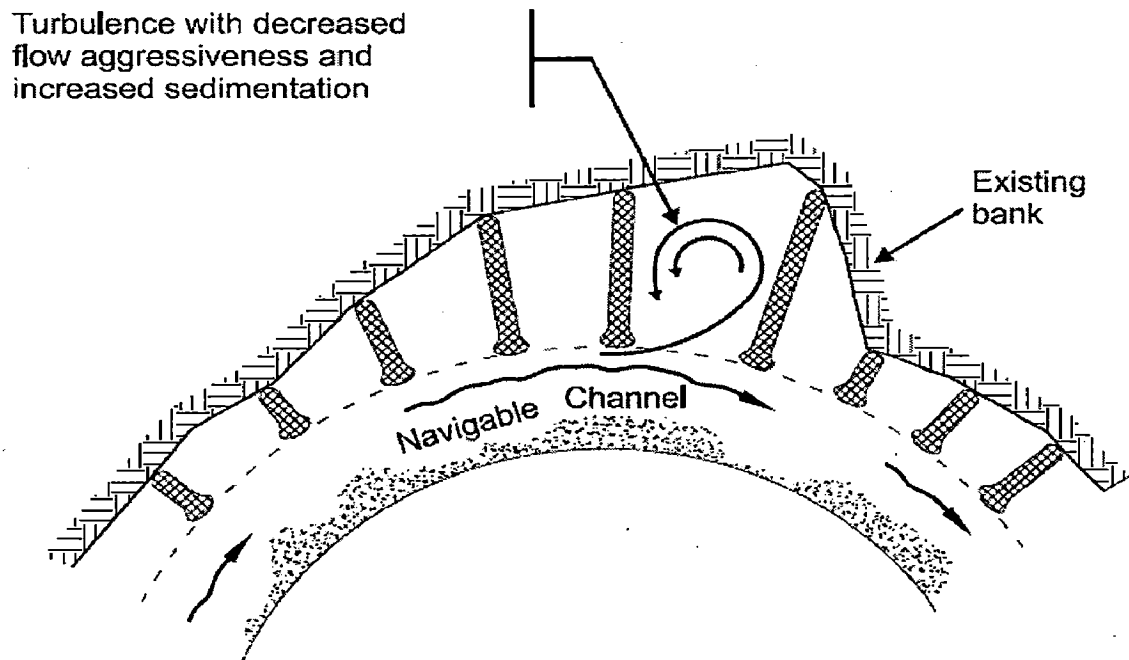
Plan View of a System of Spur-Dikes Constructed to Control and Stabilize the Erosion of the Outer Bend
